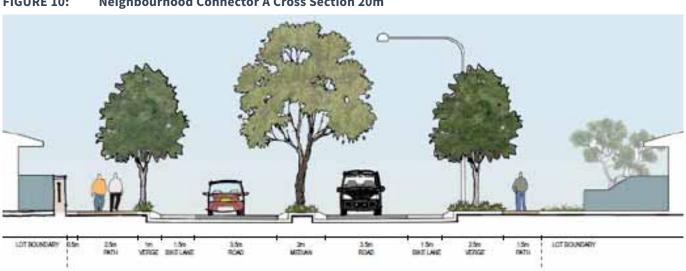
Neighbourhood Connector A Cross Section 20m
